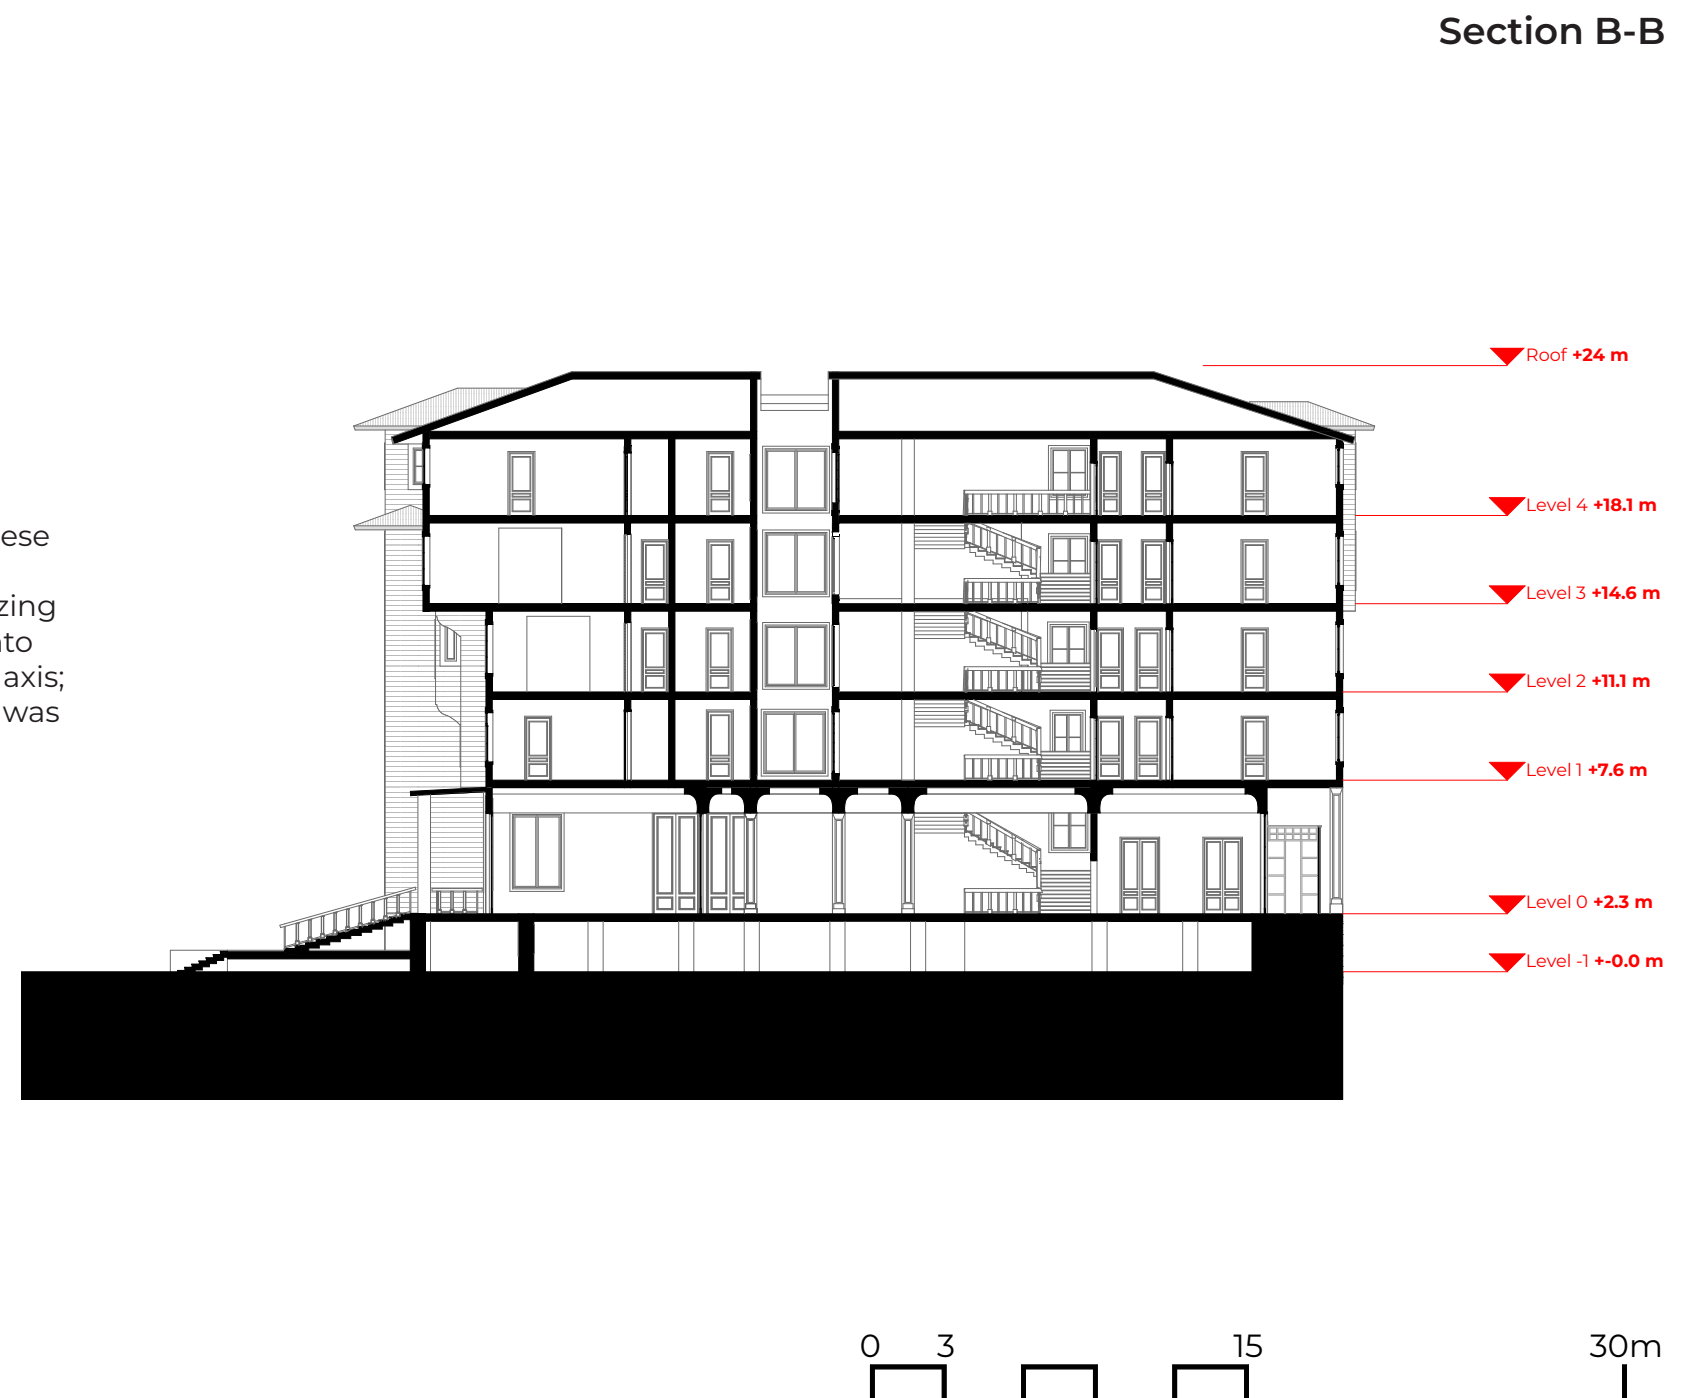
Section B-B (Source: Created by the author, 2024)
